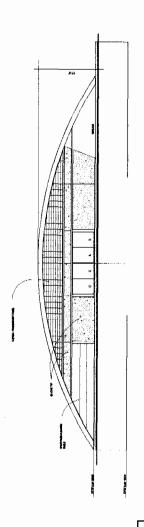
CDP 4-07-025 (Kinslow) Elevations
